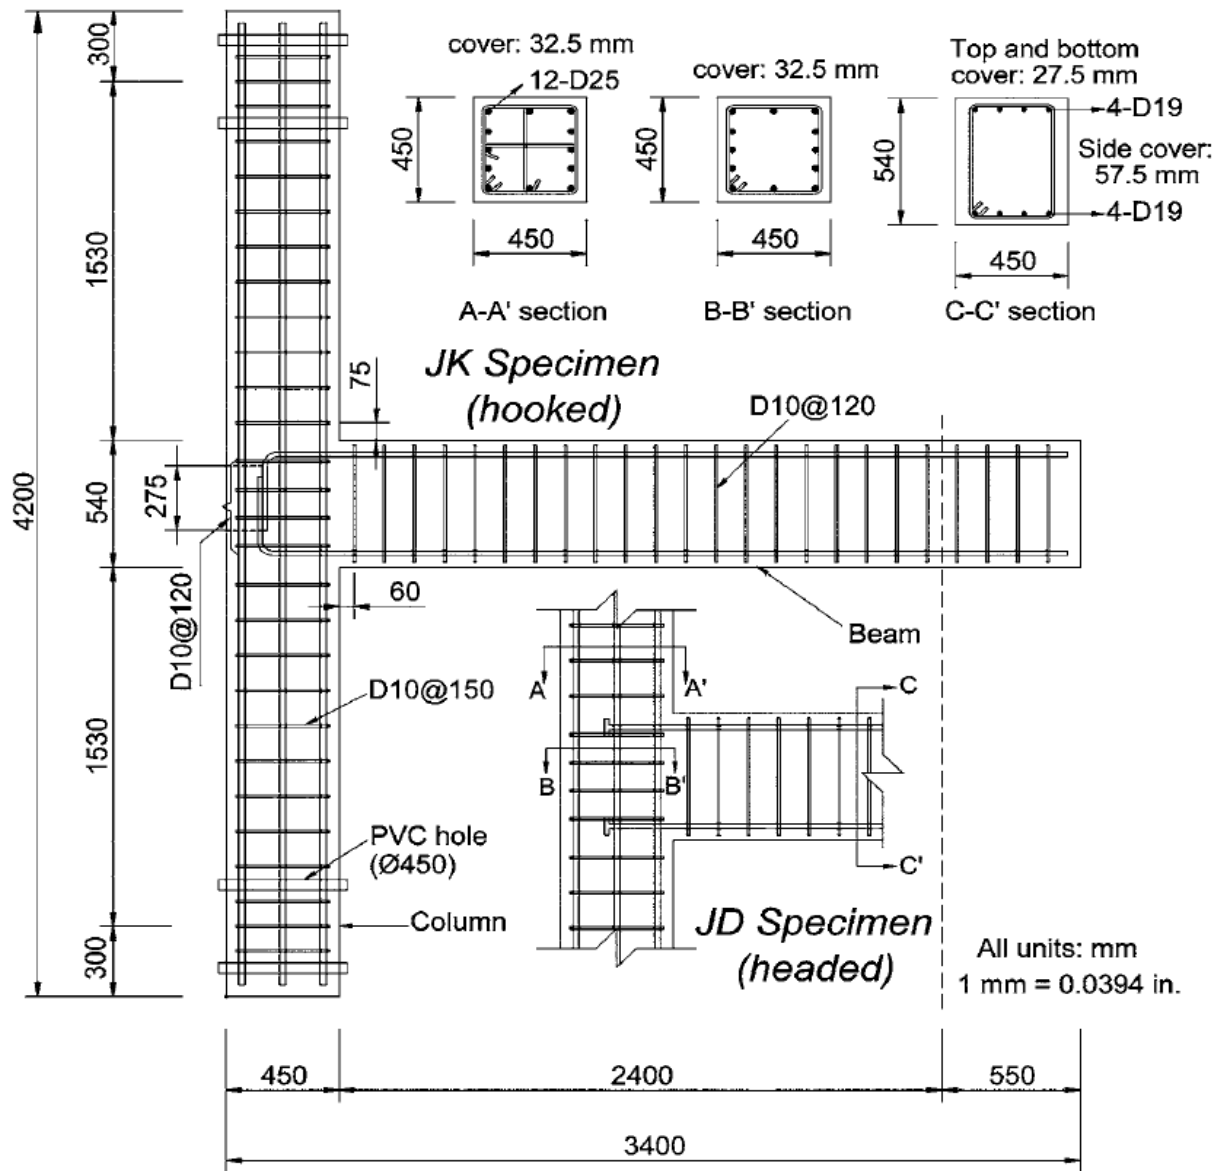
Detail of exterior beam-column joint specimens containing hooked and headed bars (Kang et al. 2010)
